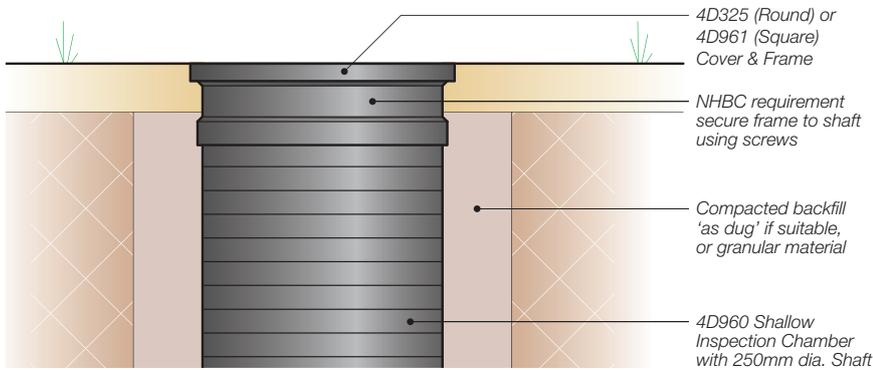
Installation detail Class A15 – For non-trafficked pedestrian applications subject to loading up to 15KN (1.5 tonnes)
